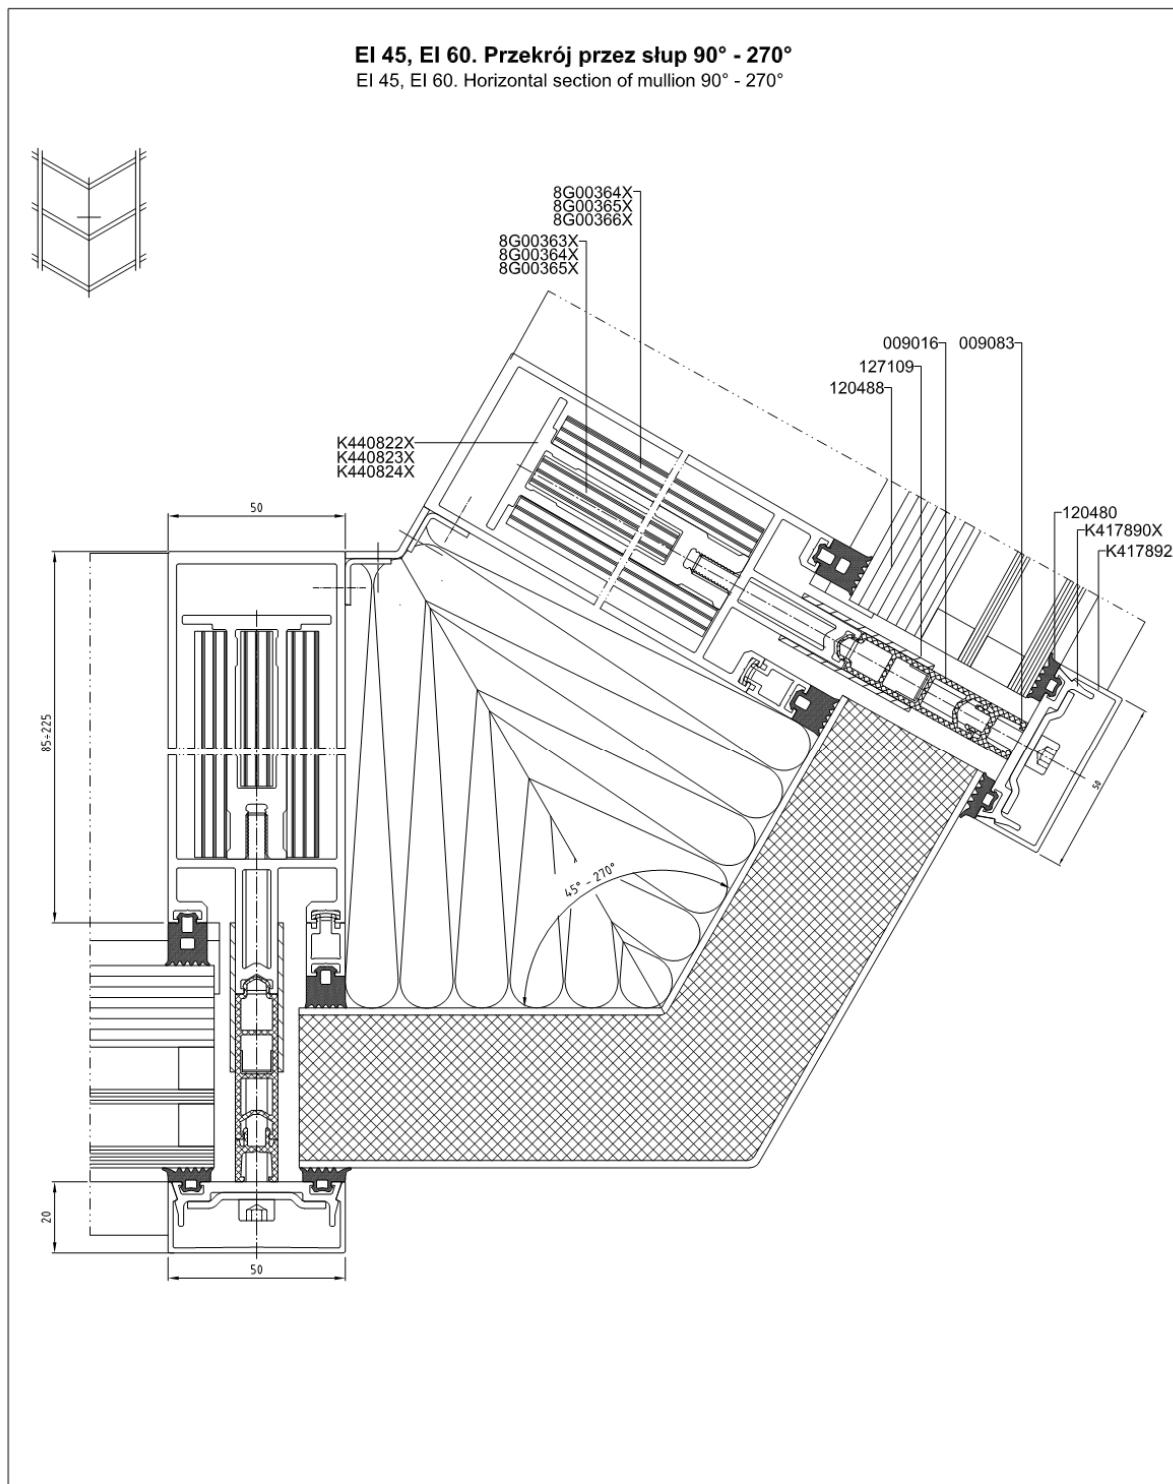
Typical cross-section through the corner of MB-SR50N EI EI60 system curtain wall
